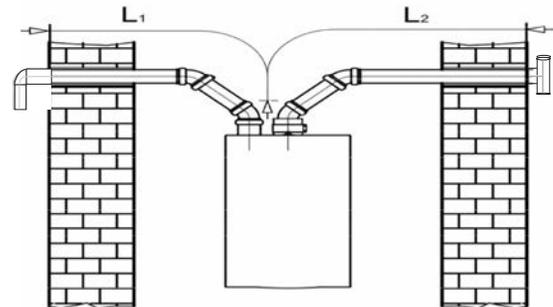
3" Twin Pipe Separated Horizontal Flue Termination
